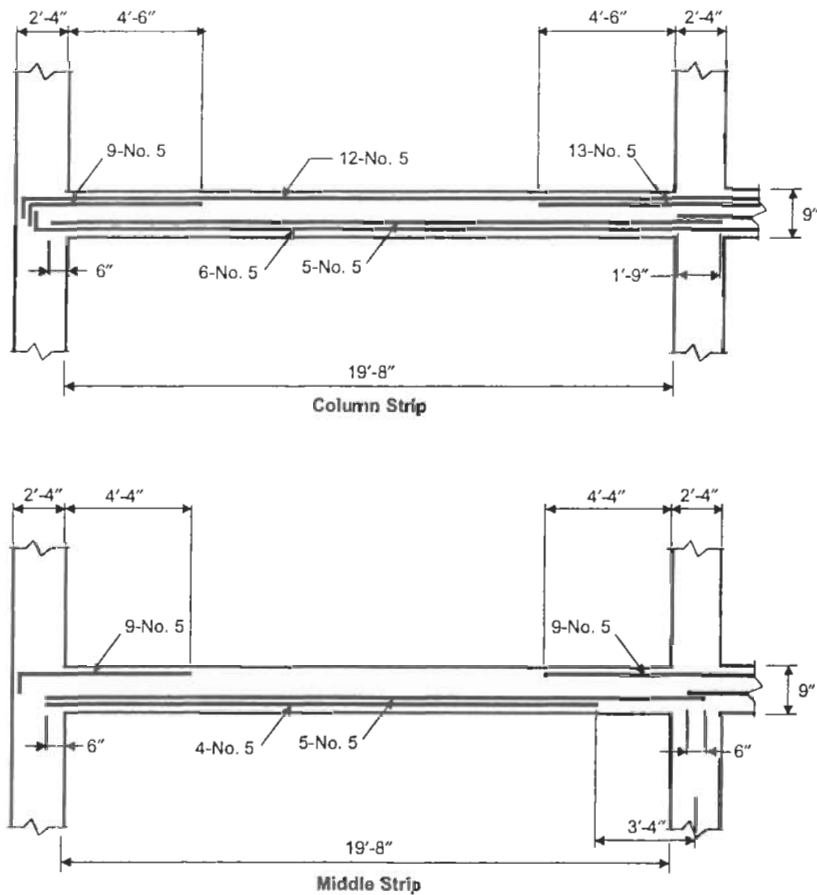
Reinforcement Details for Interior Design Strip, Floor Level 6 (SDC D)
